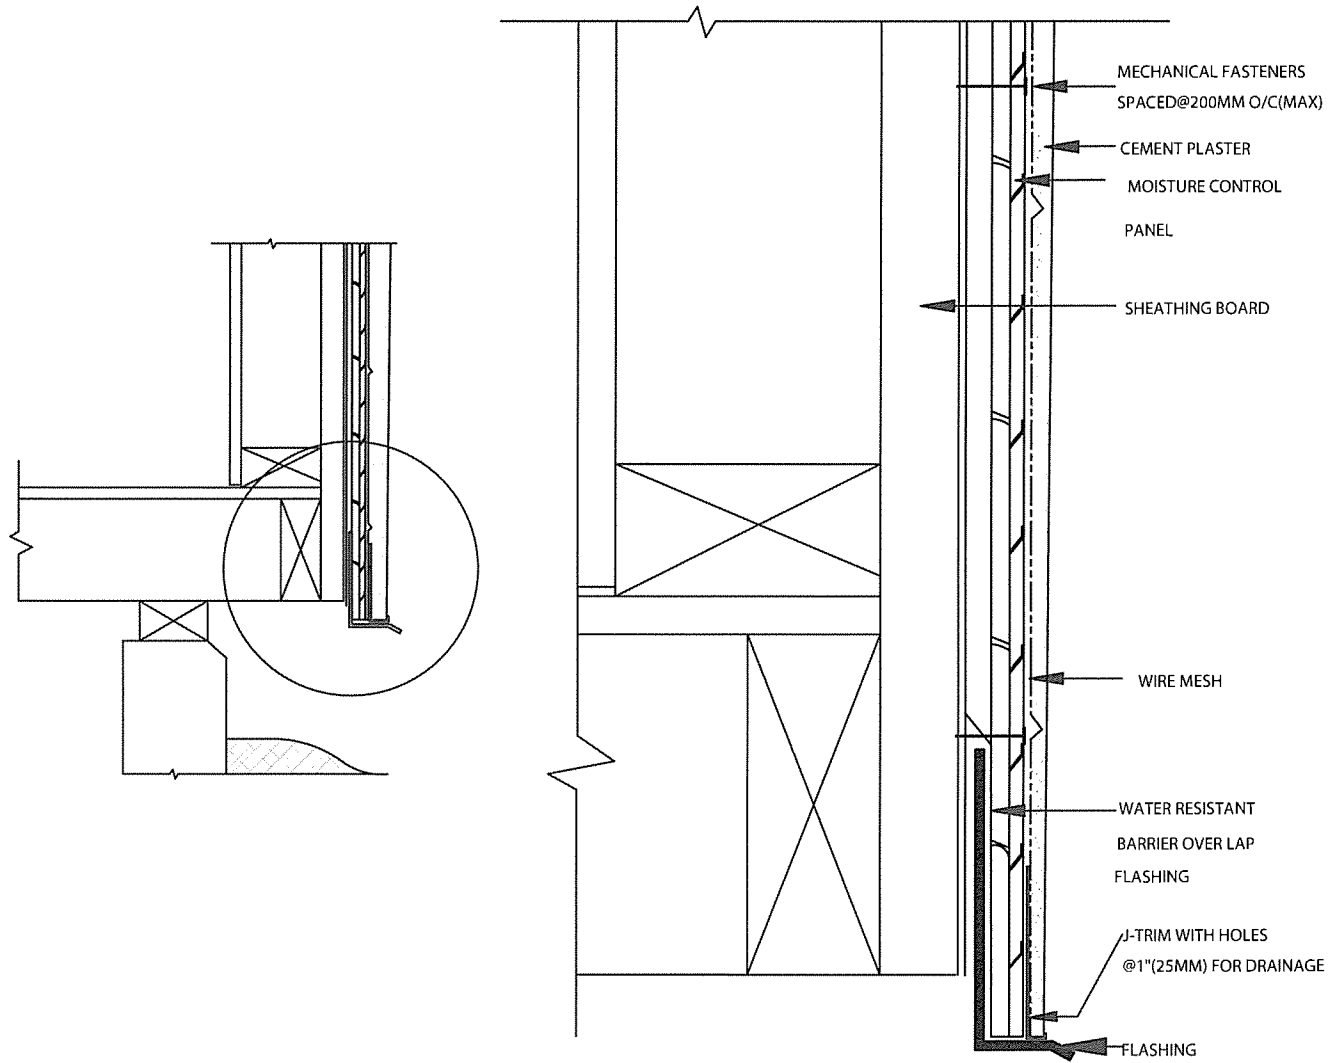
WEEP SCREED AT CONCRETE FOUNDATION
